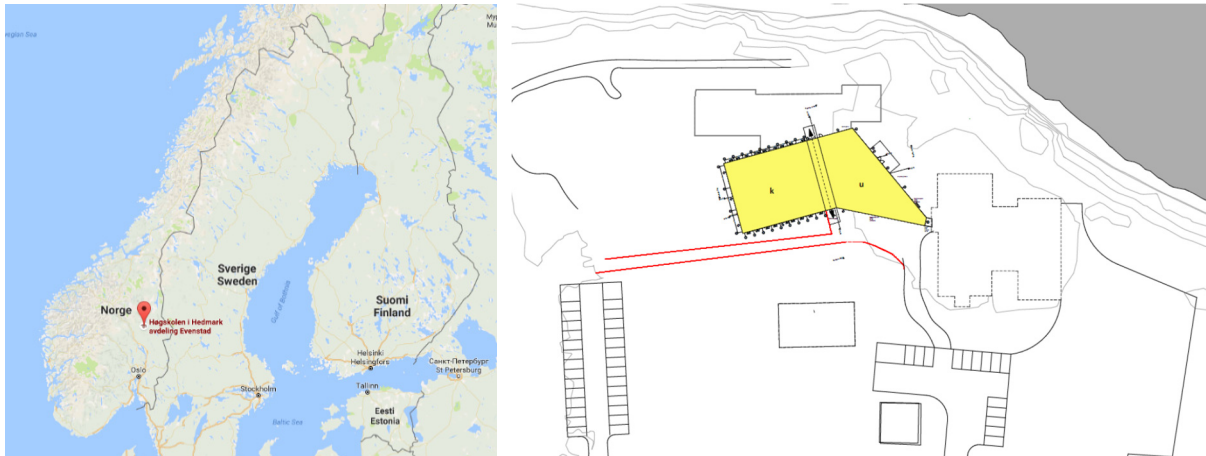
Location and site plan for Campus Evenstad [5], site plan courtesy of Ola Roald AS.
